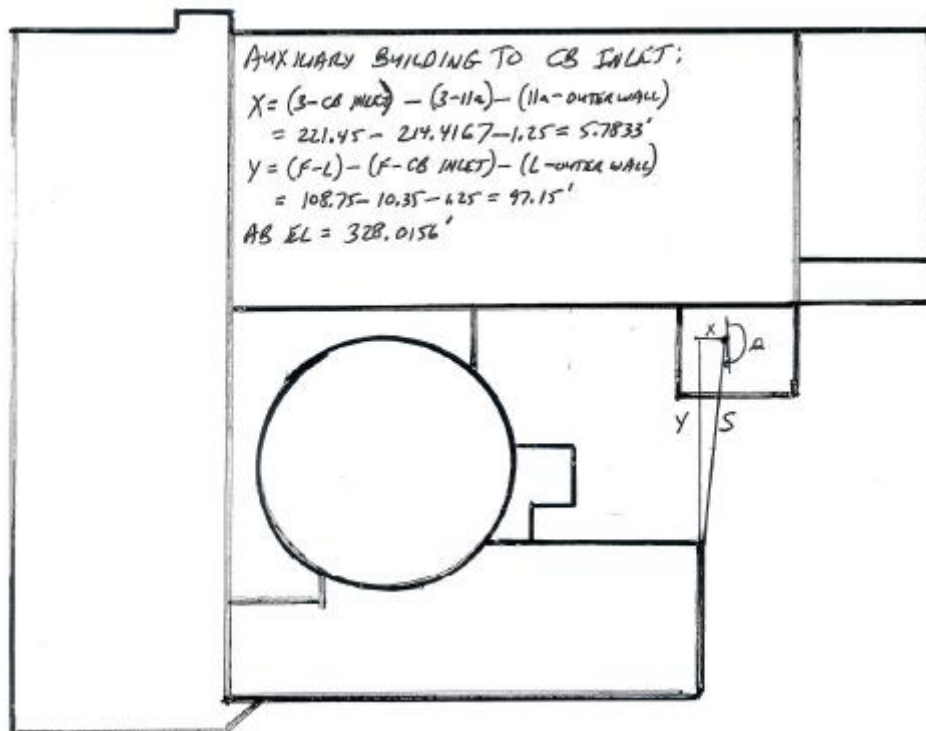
Auxiliary Building (Point Source) to Control Room Inlet
